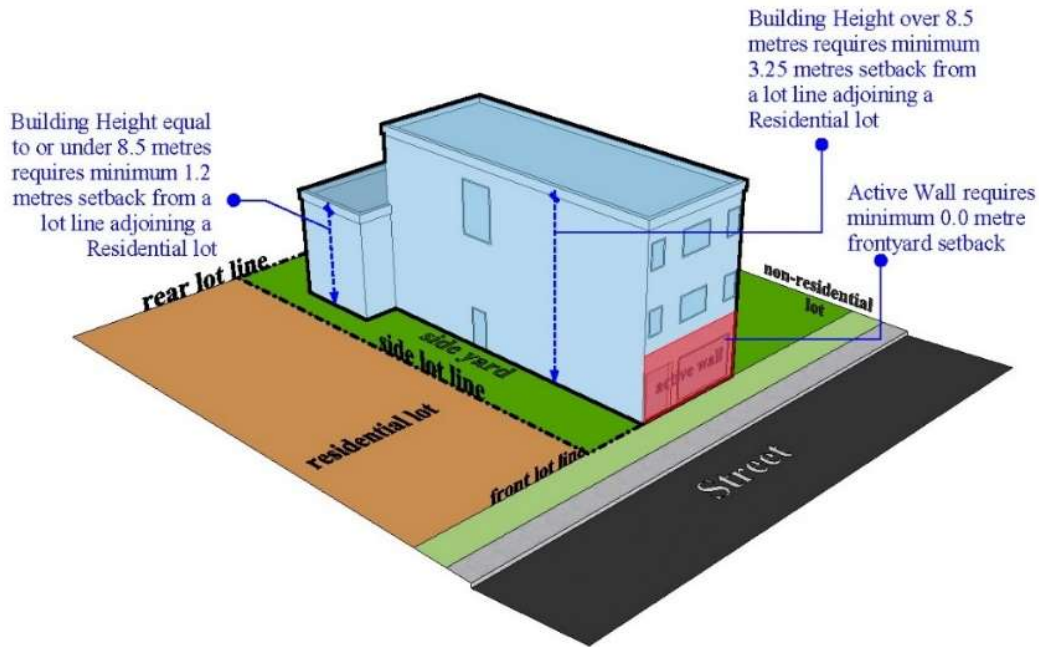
A.F1: Mixed Low-Rise Zone Active Wall
